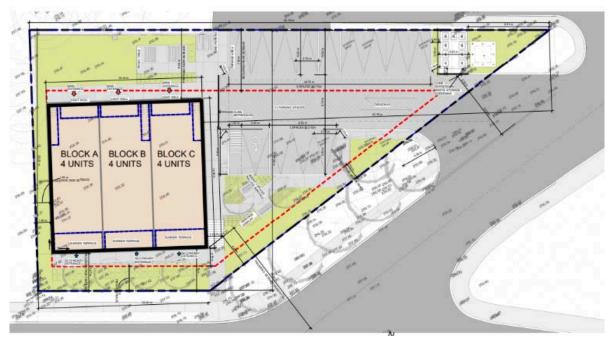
Proposed Site Plan for 37 King St (Chamberlain Architect Services Limited)
